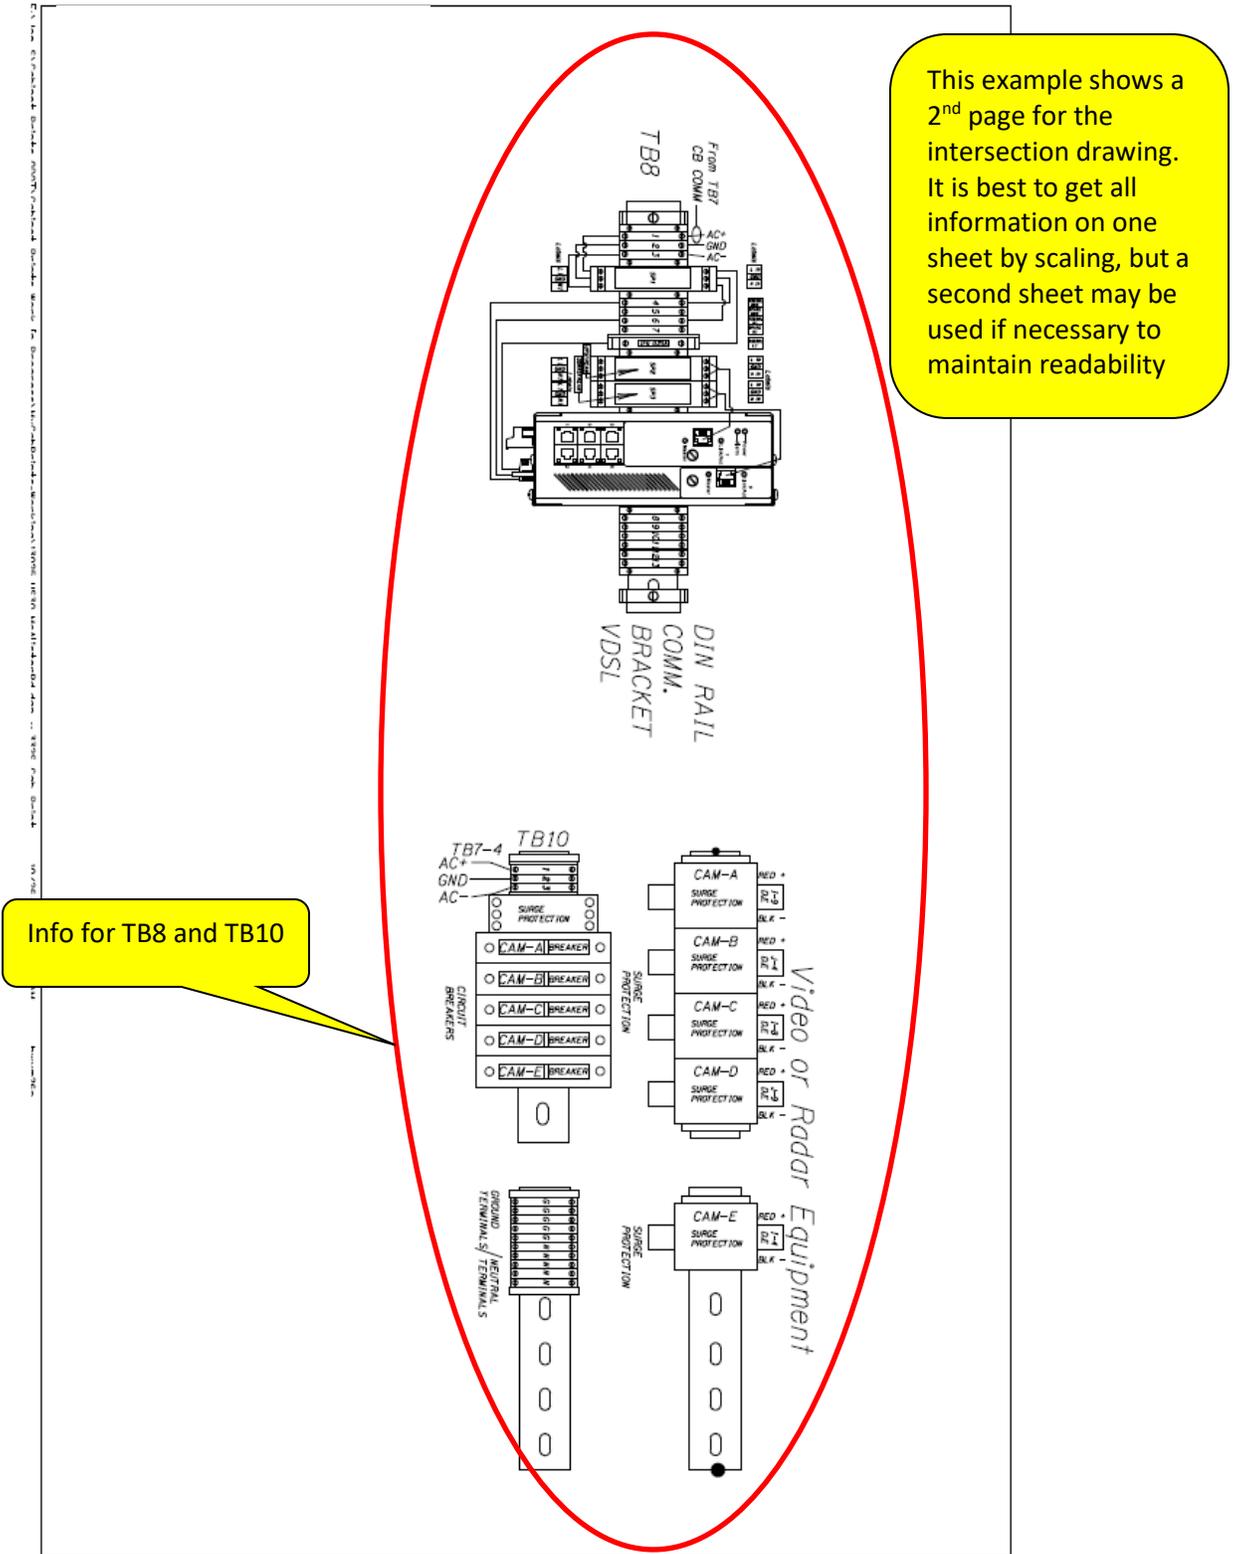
| 332S Cabinet Print (page 6 – Intersection Drawing) Example 3
